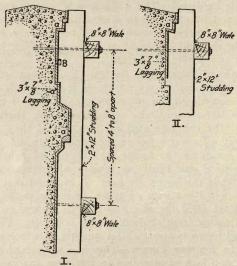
Arrangement of Studding and Lagging to Provide for Swelling.
